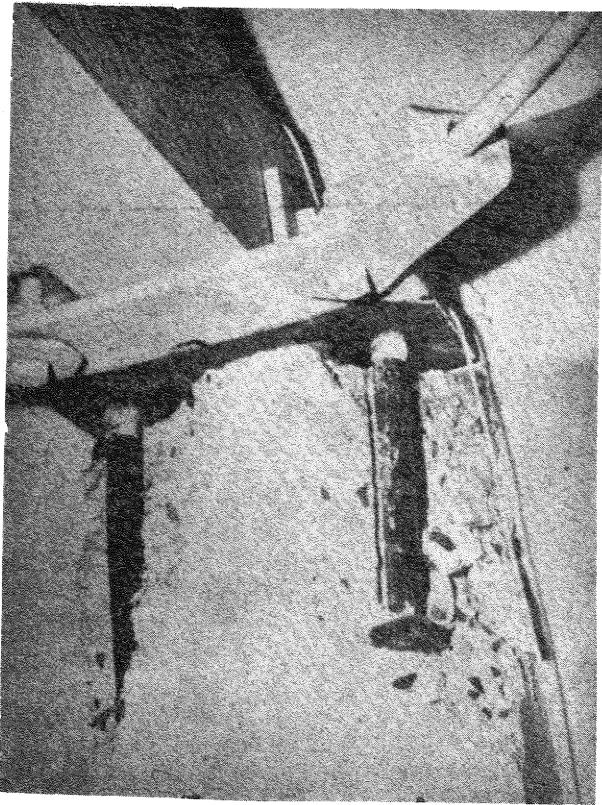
Earthquake Damage at Roof to Concrete Column Junction
